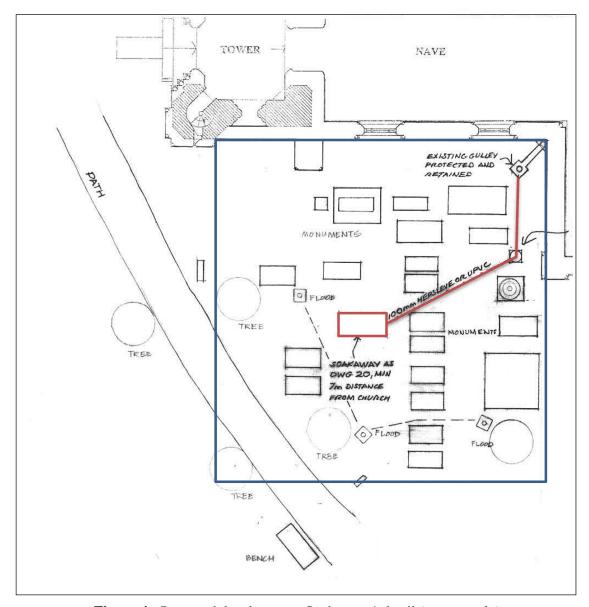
Proposed development, Soakaway 1 detail (not to scale)
